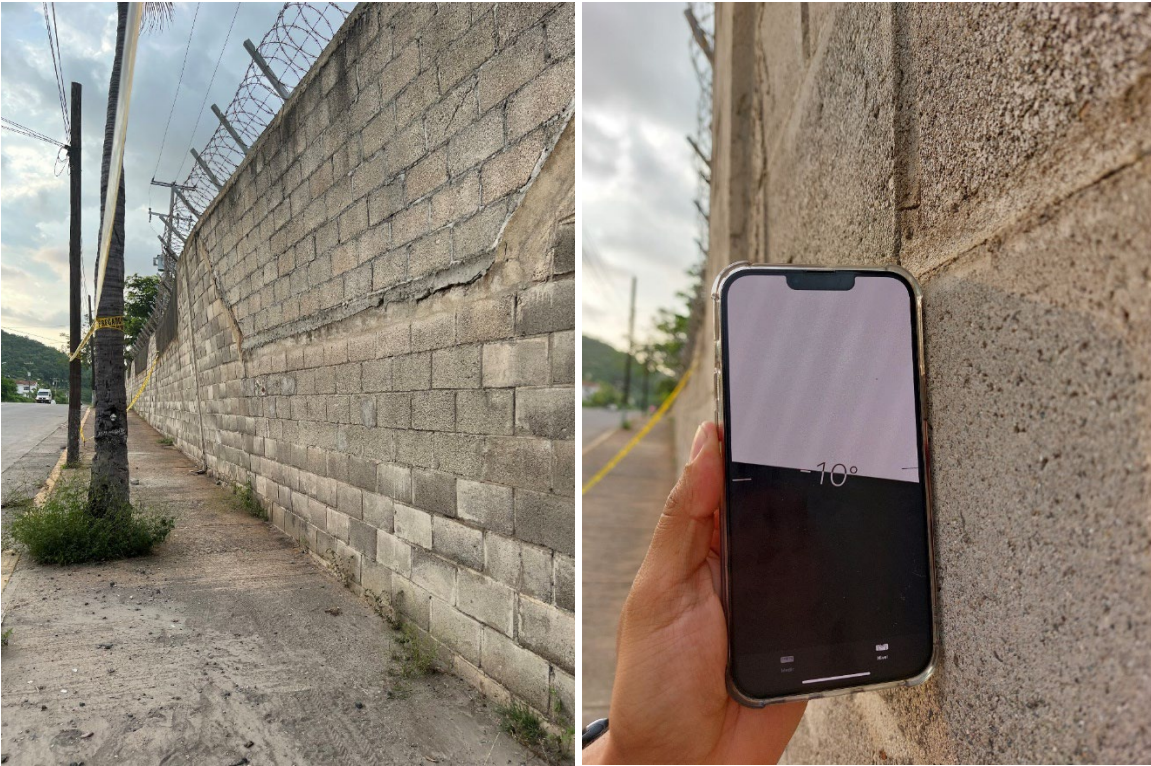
Columns failure of perimeter walls of thermal power station, Manzanillo, Colima, Waypoint Station 11 (Coordinates: 19.024788°, -104.323969°)
